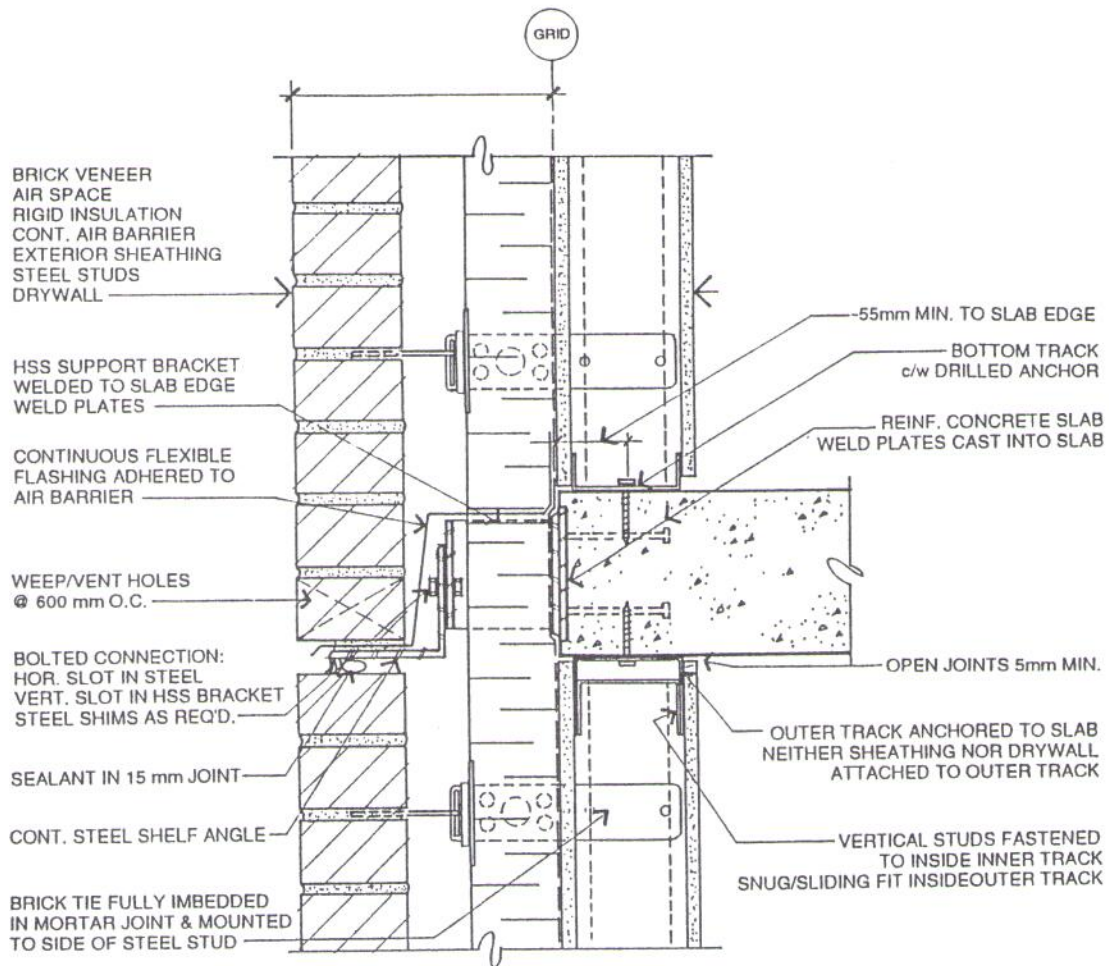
Brick Veneer/Steel Stud Detail At Slab Edge
